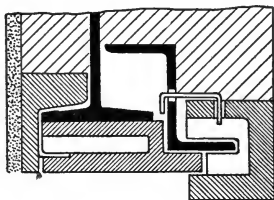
Lintel Section, Court Windows. Cable Building, Chicago.
